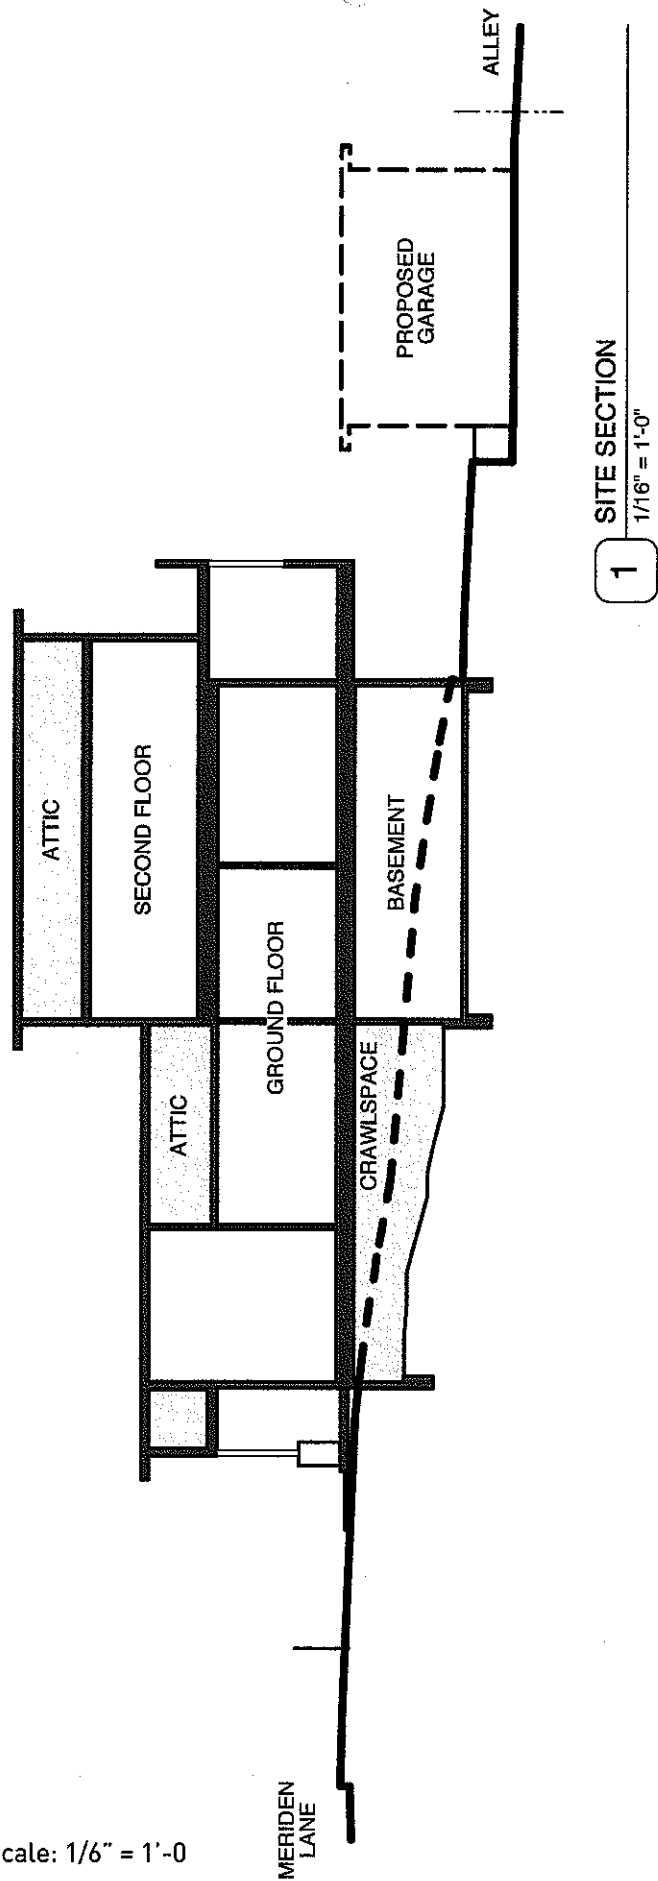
Proposed site section. Scale: $\frac{1}{16}'' = 1'-0''$
